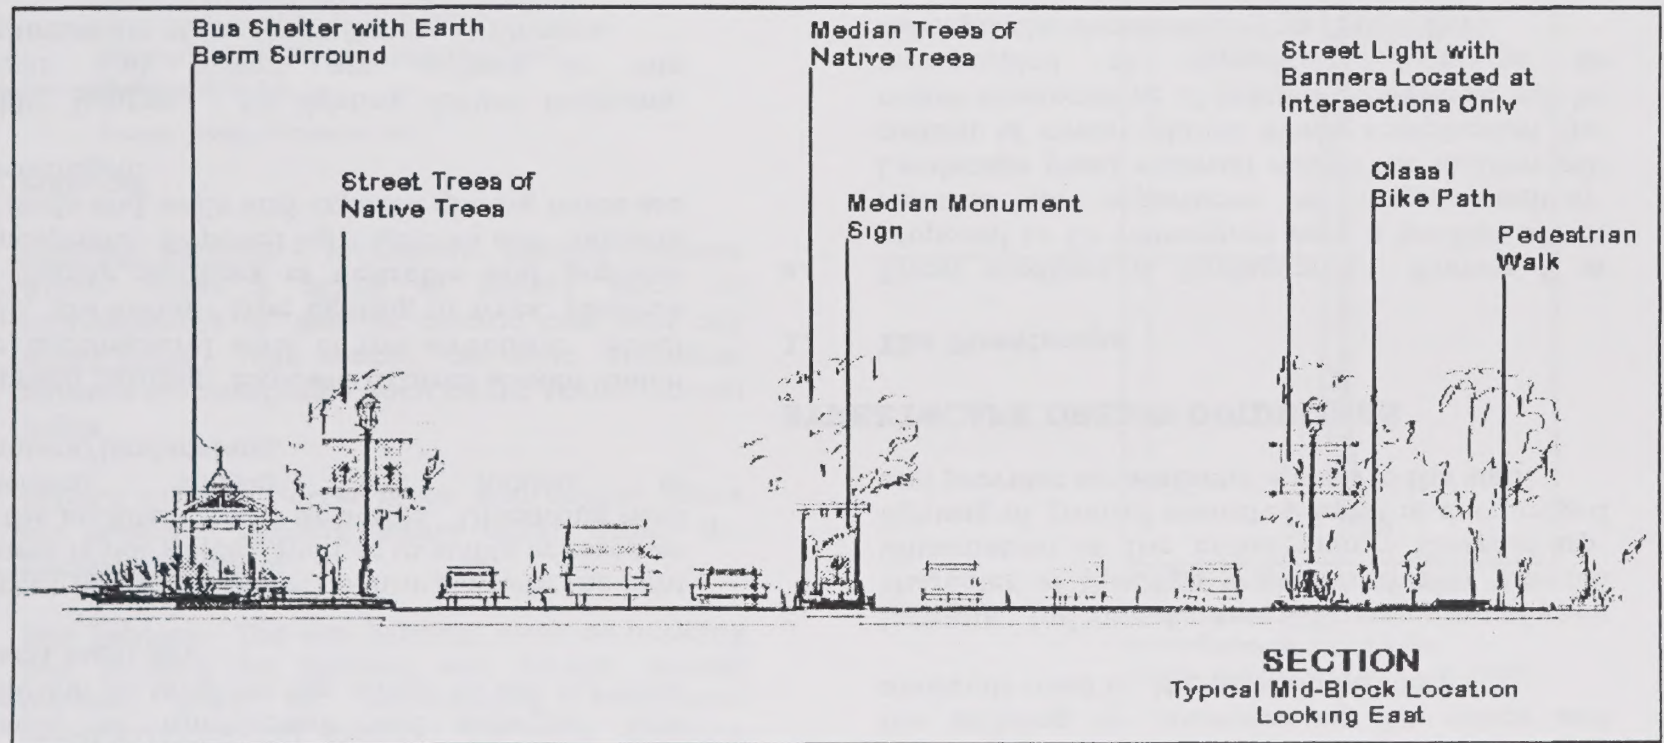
Conceptual cross-section of Avenue S streetscape.
